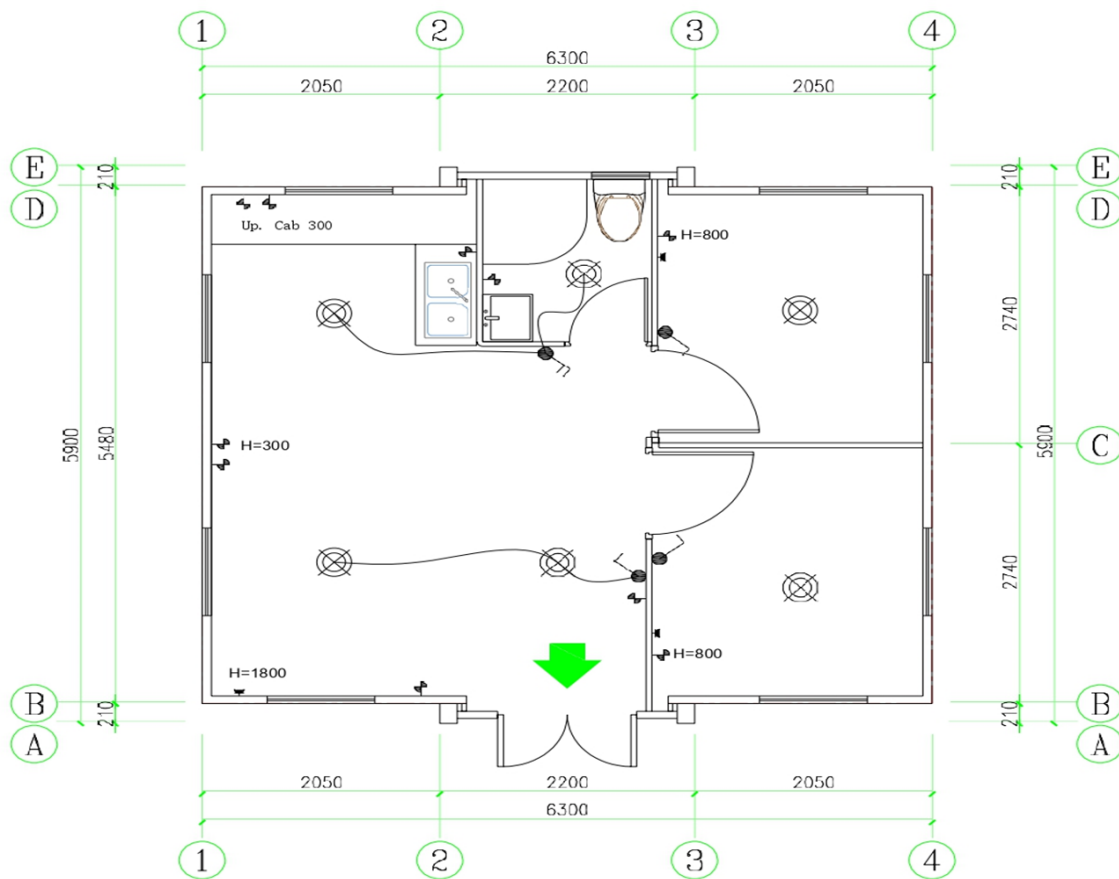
Floor plan - 20ft (37017 m2) double wing expandable container home - CAD
